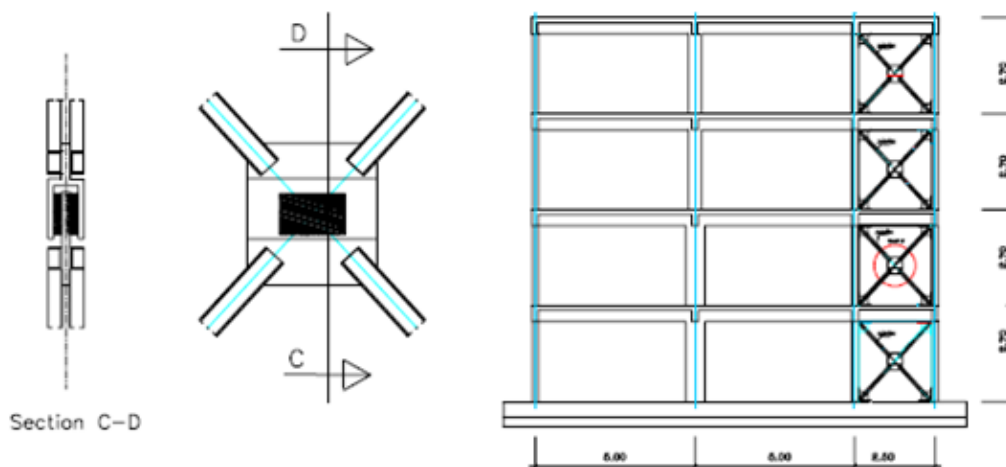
Bracing system in the shorter-external bay: device details and general layout [Varum (2003)]
